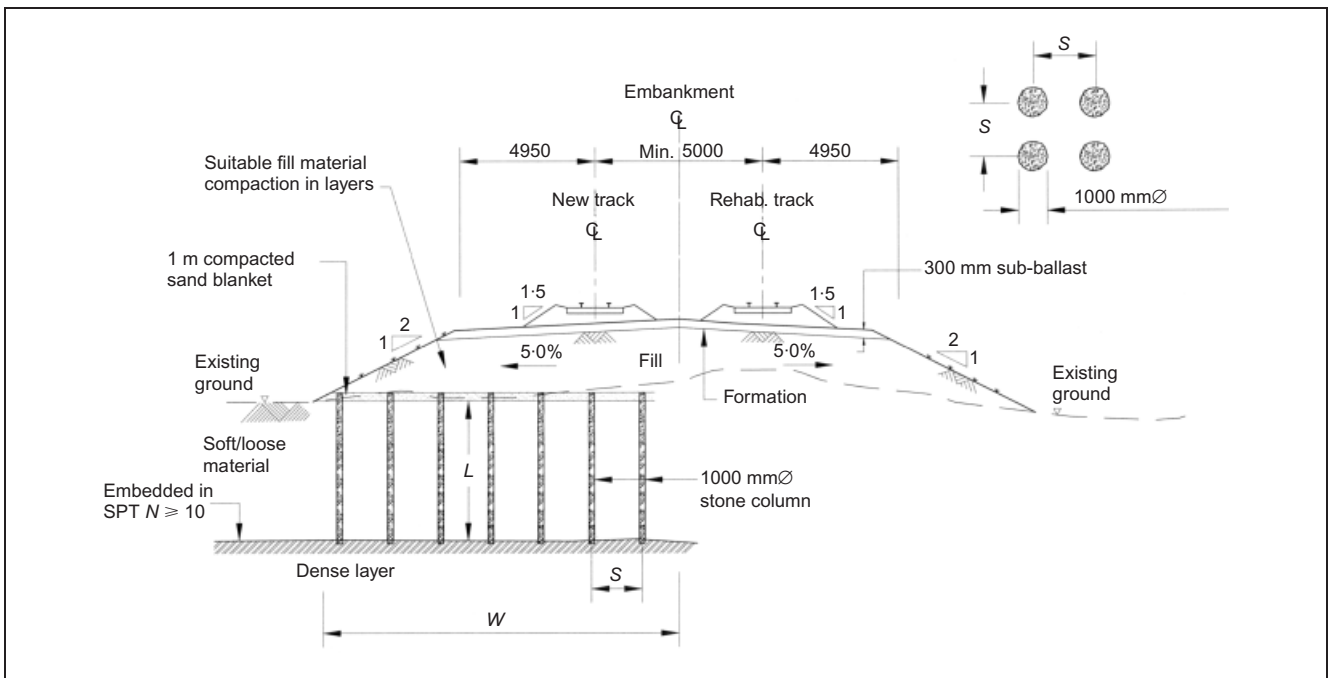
Schematic of stone column treatment scheme for partial width treatment next to the existing railway track (dimensions in mm)
